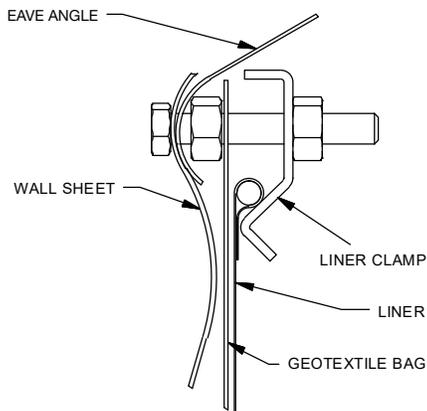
Cross-section of liner/rope sandwiched between wall sheet and liner clamp
